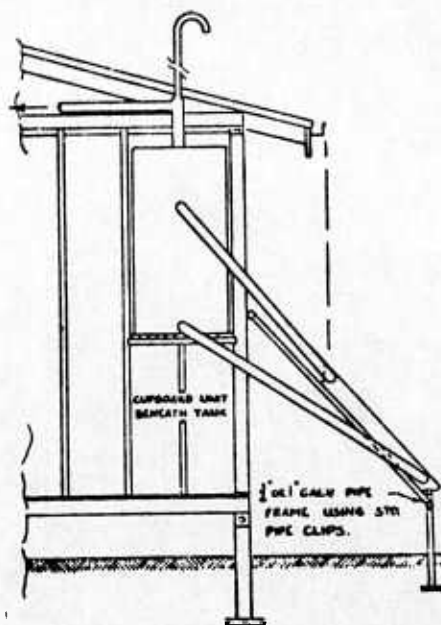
Typical domestic installation showing storage tank supported on partition wall between two rooms, Australia [64].
